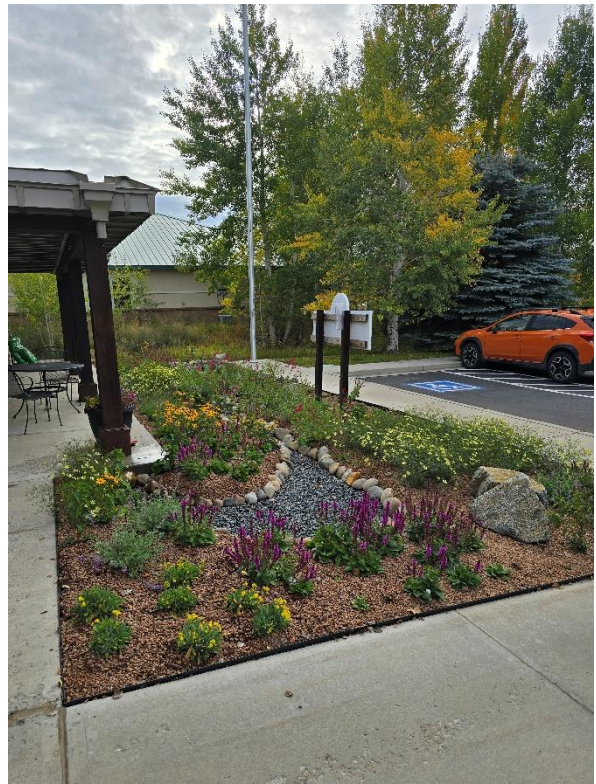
Same area as Photo 12 after complete installation of rock-scape.
